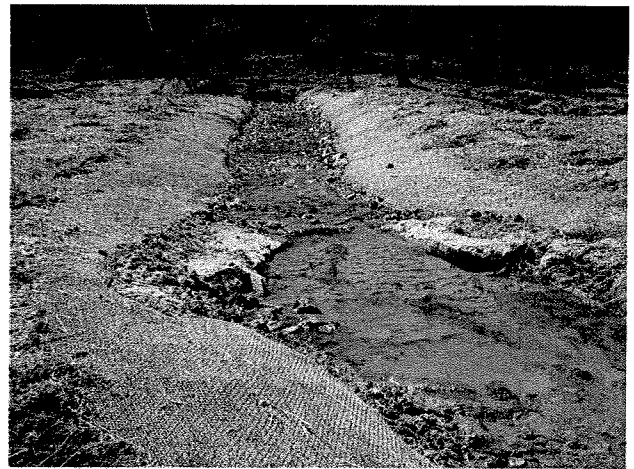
Looking downstream at cross vane installed at LT Station 5+90. (9/27/04)
